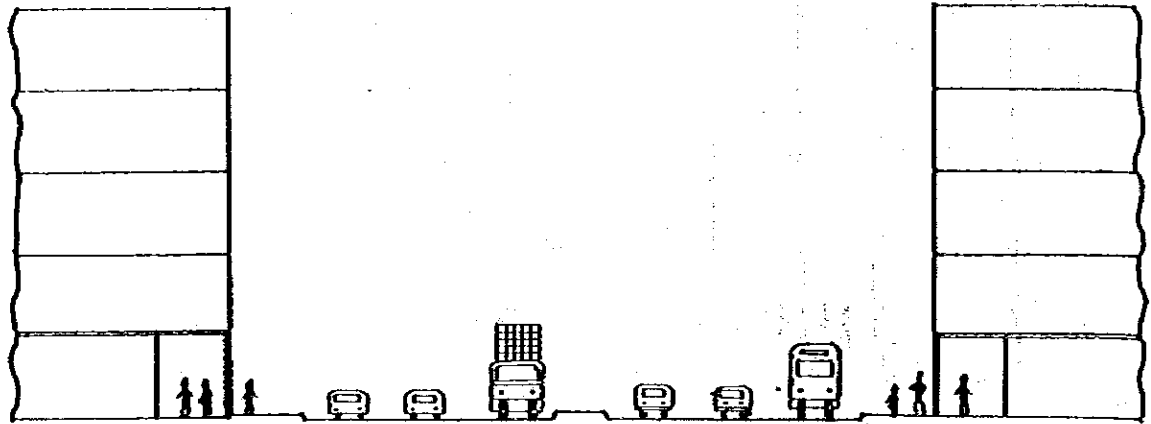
TYPICAL CROSS SECTION (Monorail)
